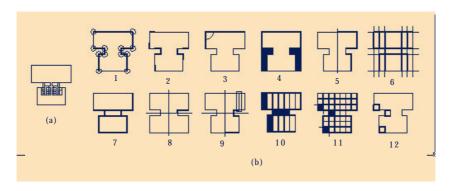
Multiple representations of a building floor plan: (a) primary floor plan; (b) 1 to 12, multiple possible representations of the floor plan shown in (a) [18]
